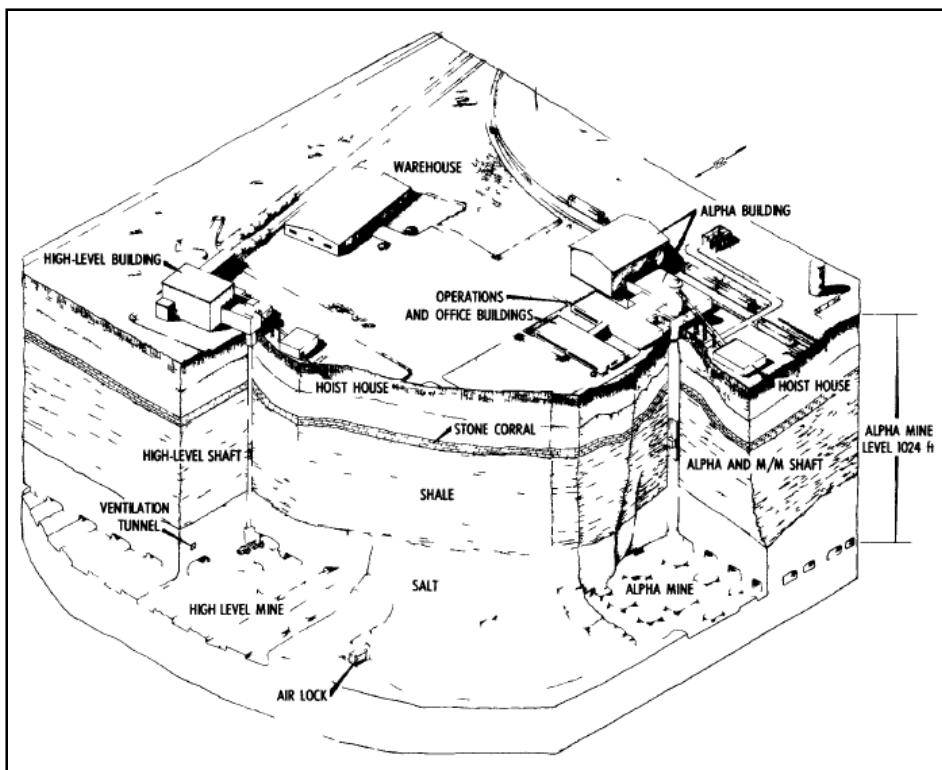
Cross Section of the PSV Disposal Concept (from Blomeke, 1977)
